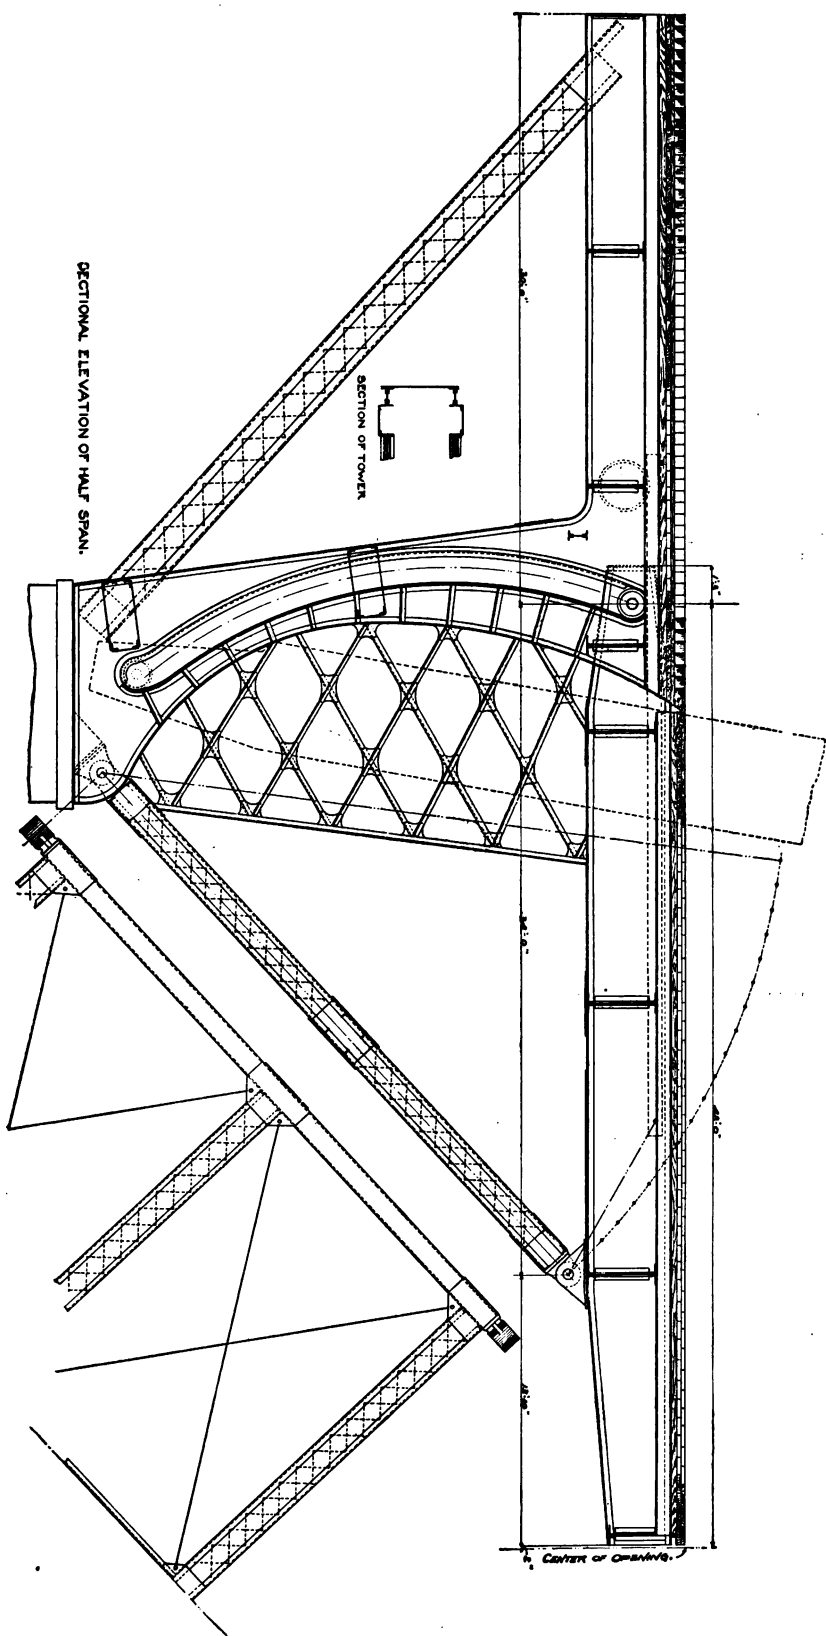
SECTIONAL ELEVATION OF HALF-SPAN.
